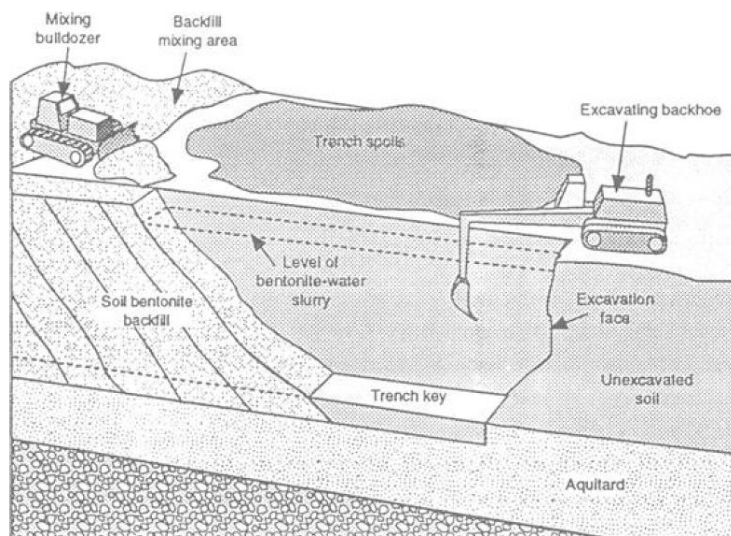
Construction of a soil-bentonite cutoff wall (from Lagrega et al. 1994)
